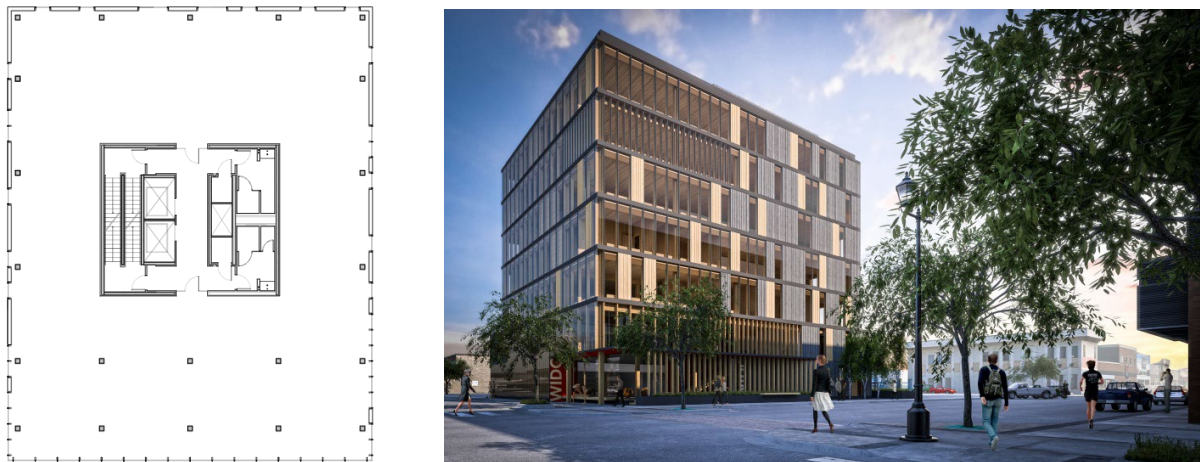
Wood Innovation and Design Centre typical floor plan and rendering (courtesy of MGA | Michael Green Architecture).
